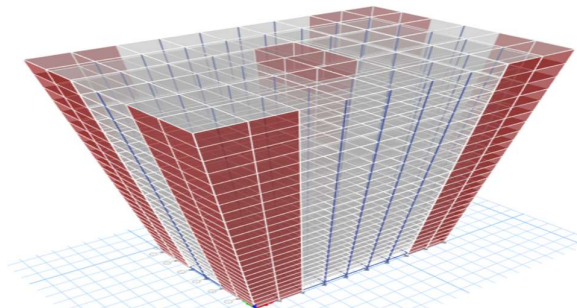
3D View of Bare frame model having shear wall along X and Y-direction and core wall at center
